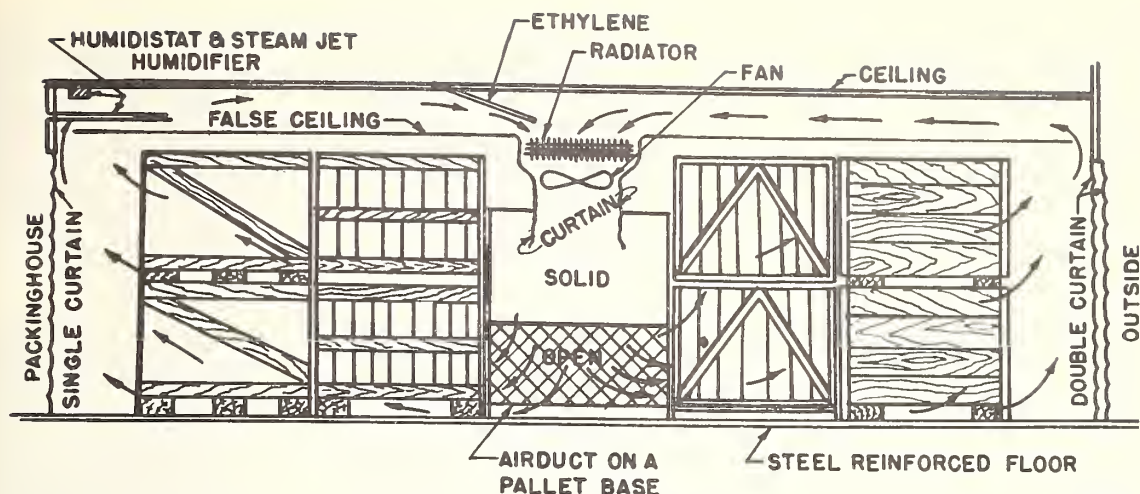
Diagram of the pallet box degreening room. The excessive space left at the walls was unavoidable because the room was not designed originally for pallet boxes.
